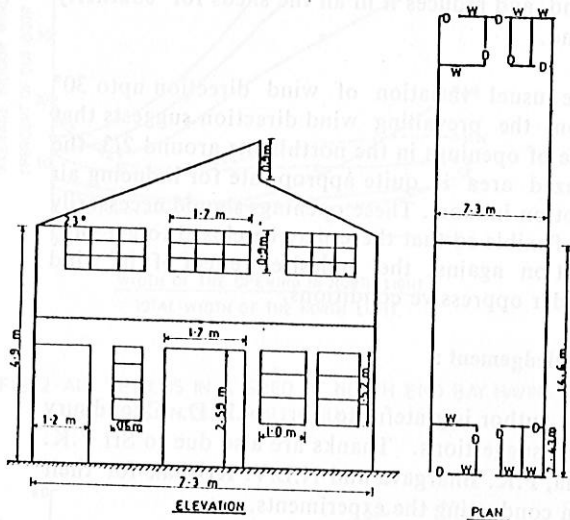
PLAN AND ELEVATION OF A BAY OF SAW TOOTH ROOF SHED.
